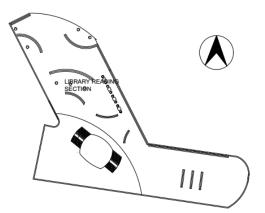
2<sup>nd</sup> Floor PLAN, cultural center, student 2020
